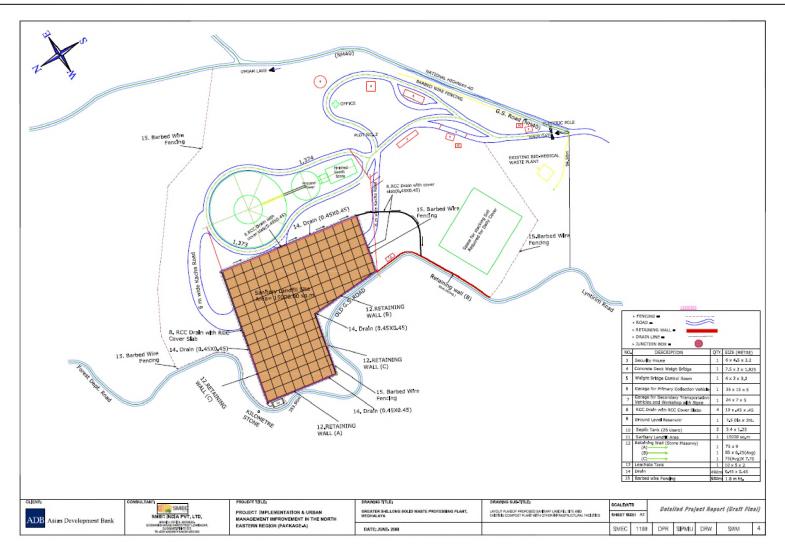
LAYOUT PLAN OF LANDFILL SITE AT MAWIONG, SHILLONG
